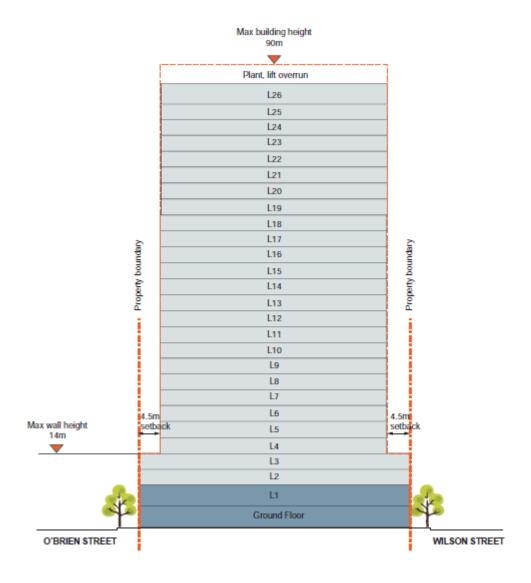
O'Brien Street & Wilson Street frontage, building heights and setbacks (building envelope)
